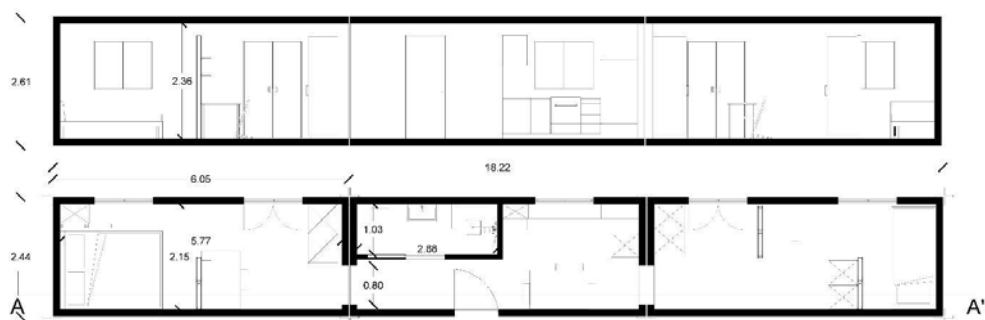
Binnen bleiben – Floor plans of triple container<sup>75</sup>
